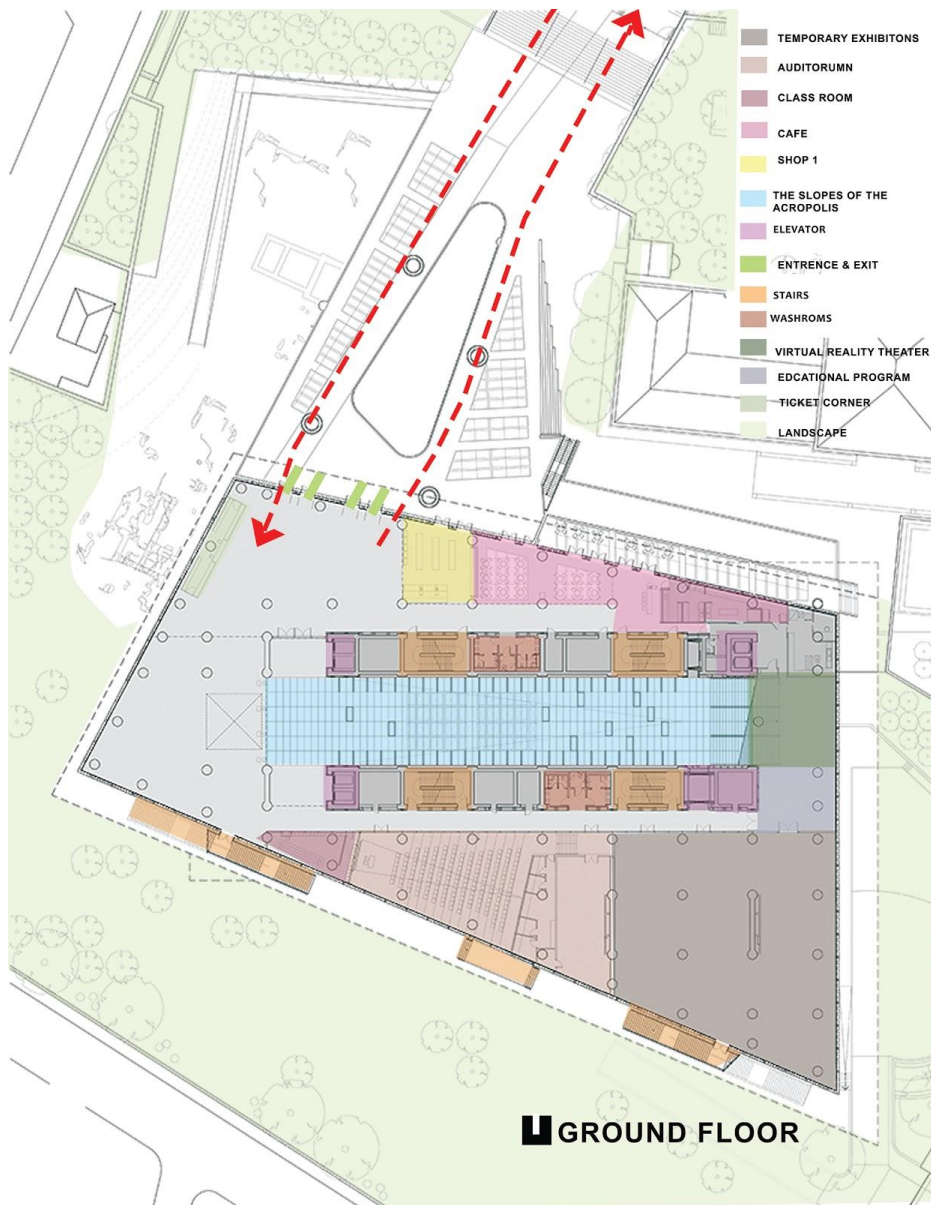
Site Planning and Landscape detailing of the Acropolis museum
